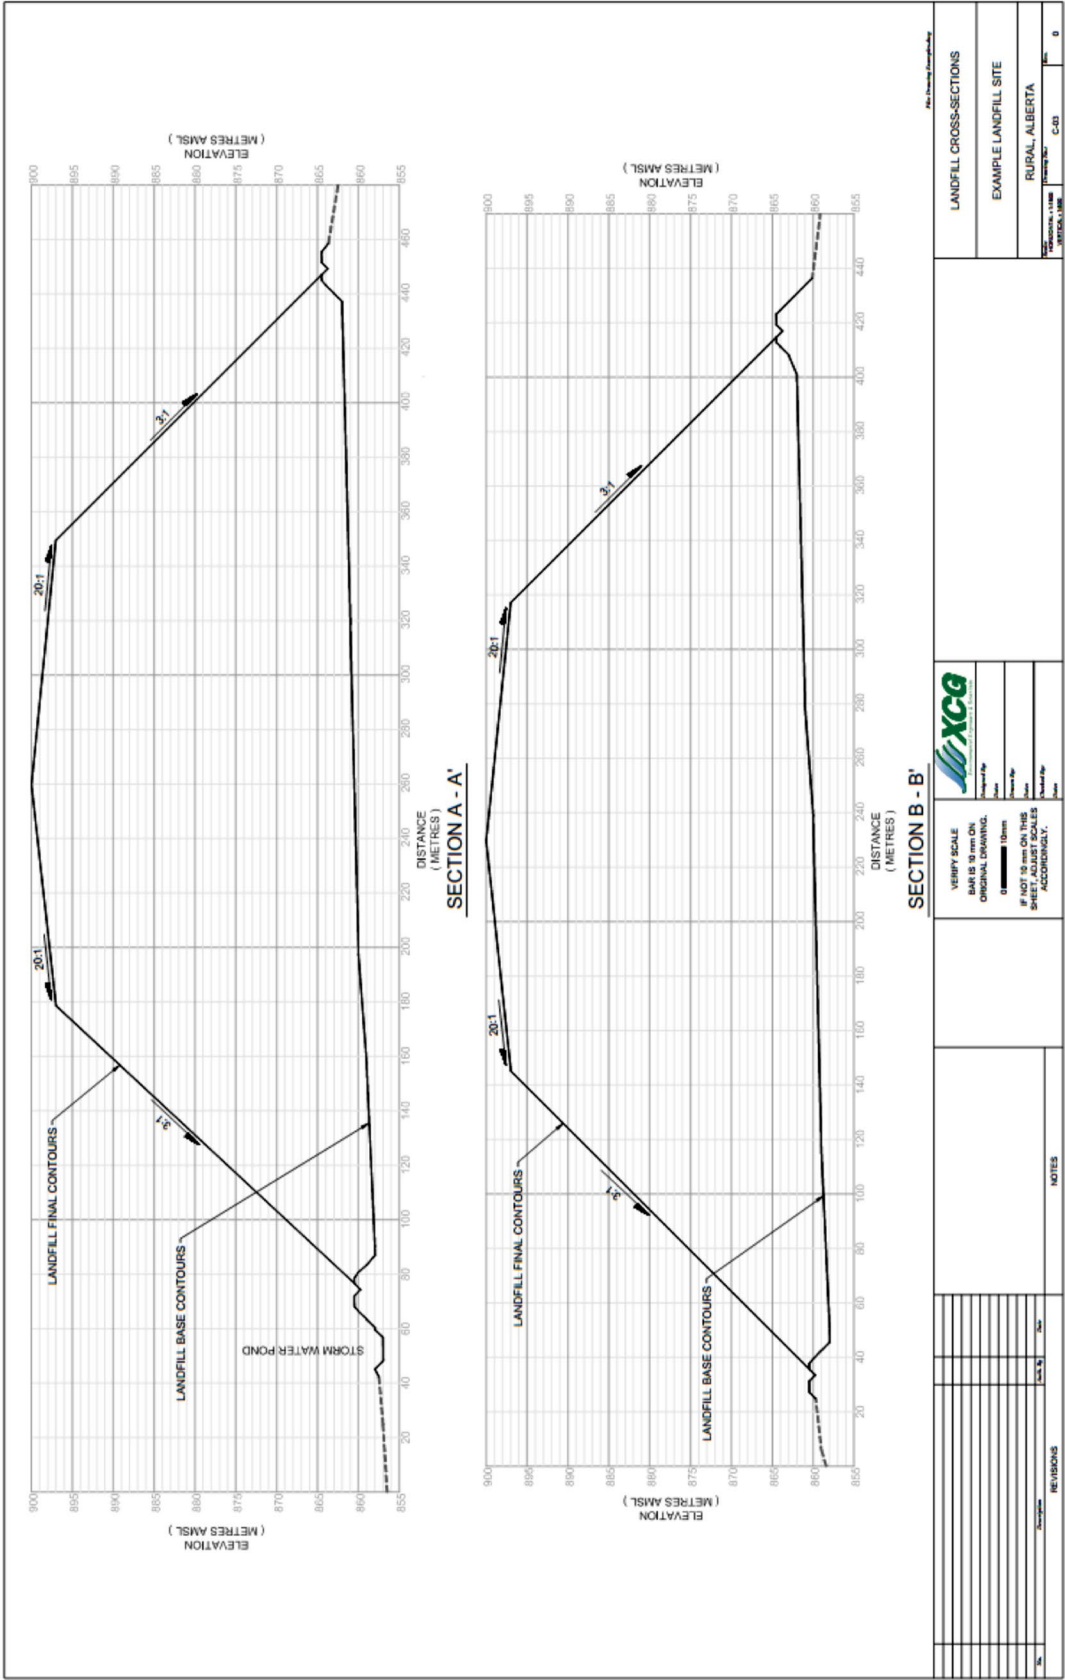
Typical Landfill Design Drawing – Landfill Cross-Sections
